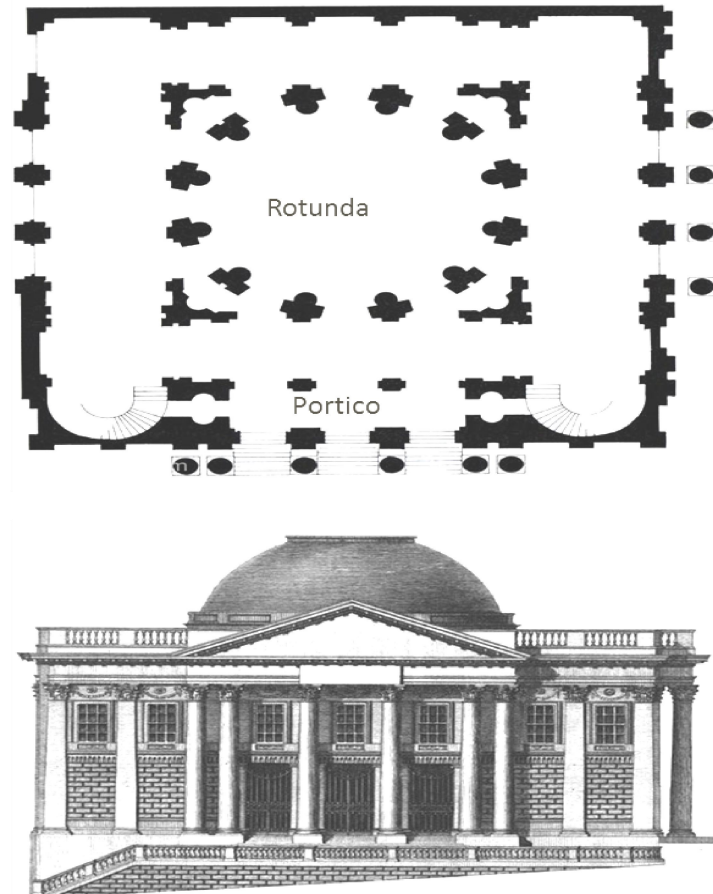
Floor Plan/Elevation of City Hall Dublin designed by Thomas in 1779. Cooley, URL, 7
